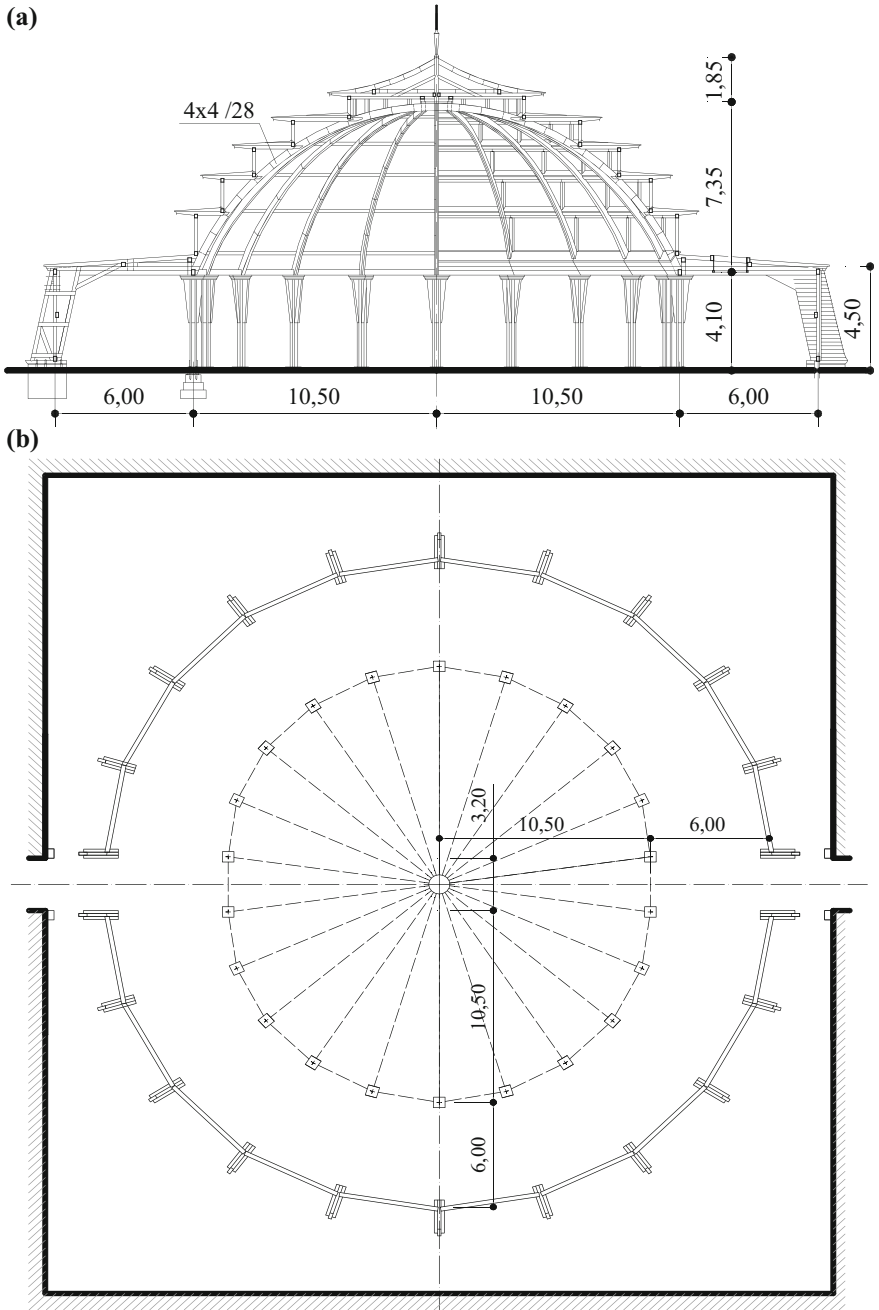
Dome by Hatz F. from 1925 in Munich according to [1], a vertical section, b projection at the level of the ground floor
